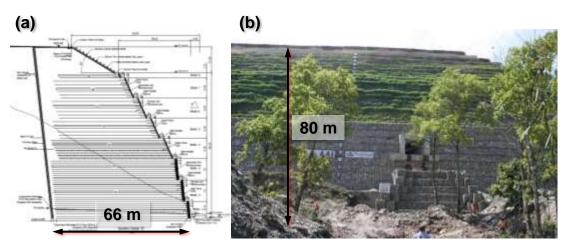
High (80 m) geosynthetic-reinforced wall constructed for the Sikkim Airport: a) Cross-section, b) Front view (Zannoni 2011)
